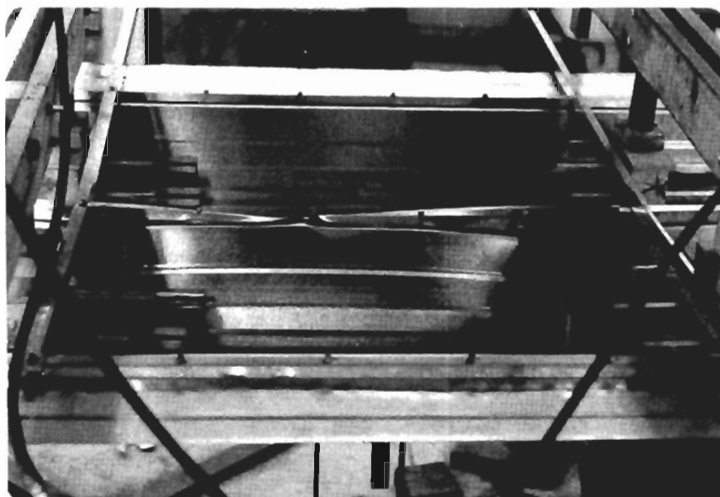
STIFFENER FLANGES ON EDGES OF STRAIGHT PANELS
